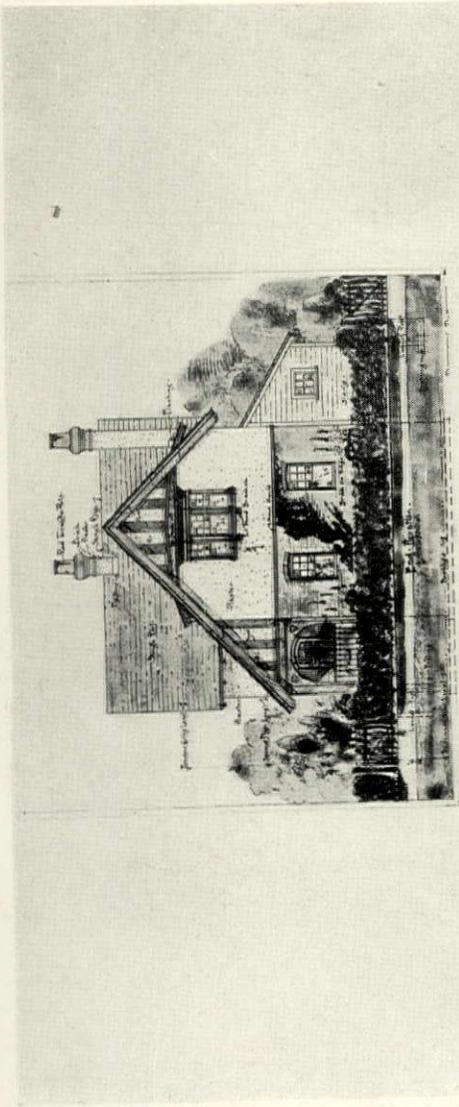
ELEVATION AND PLANS OF SEVEN-ROOM HOUSE—ALUMINUM CO. OF AMERICA, MASSENA, N. Y. ALBERT H. SPAHR, ARCHITECT.
